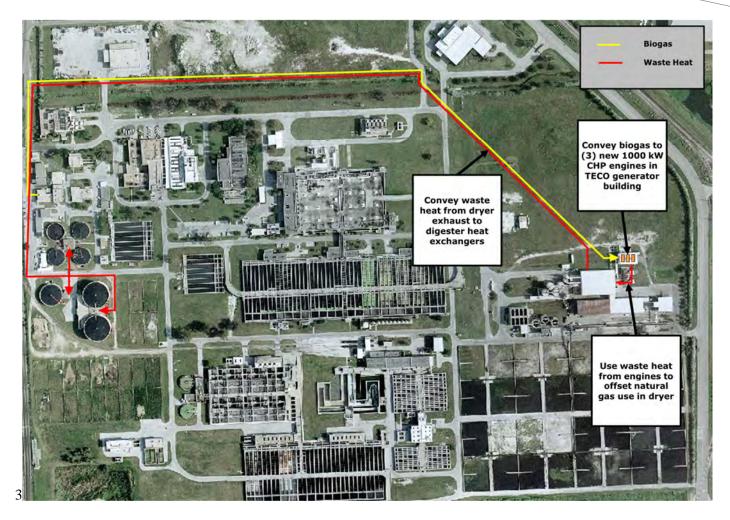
Alternative No. 3 Conceptual Level Site and Equipment Layout
